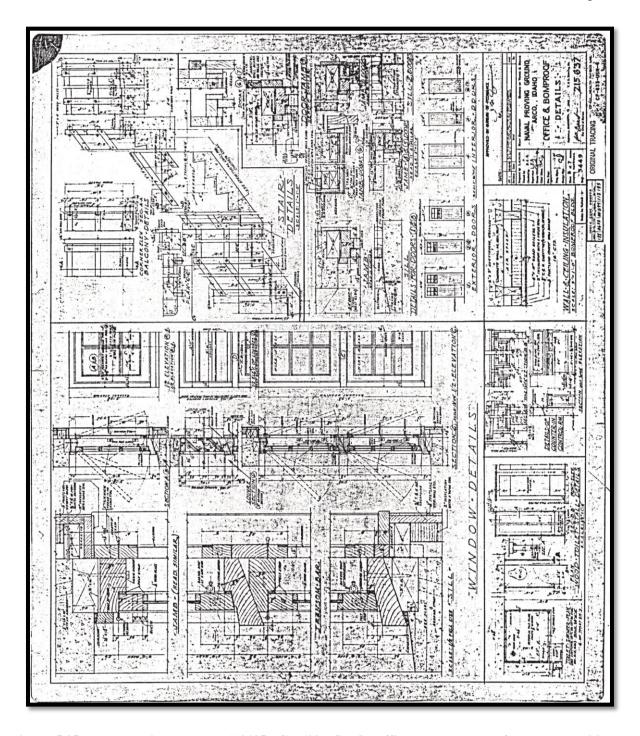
INL drawing number 112185 (CF-633-USN-4); office and bombproof storage (addition on southwest elevation of concussion wall / CFA-633 – extant), details; sheet 3 of 7; ca. 1943.
